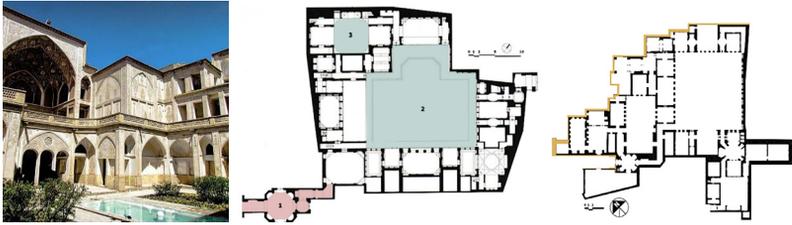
The plan (middle) and a photo of Abbasi house in Kashan, Iran (left). Right: plan of Shokuhi house in Yazd, Iran. Both plans demonstrate the unknown and intricate geometry.
